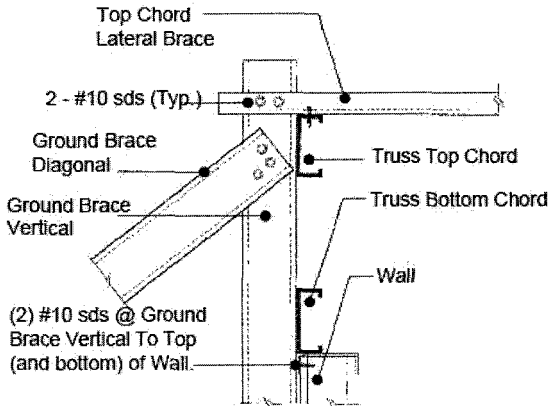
Ground Brace Connections (LGSEA 1998a)
